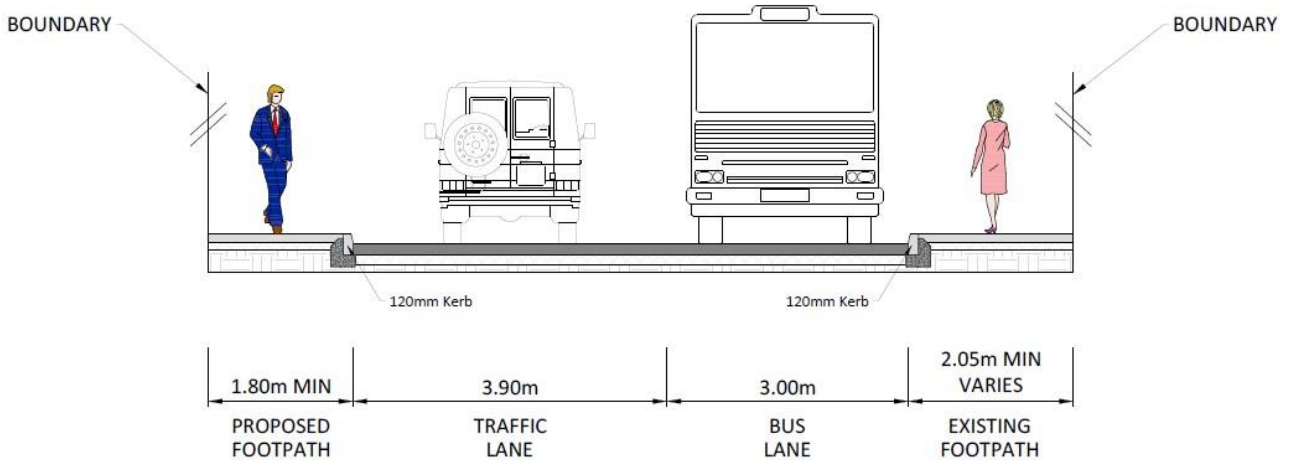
West of Monument Cross Road - Typical Cross Section
